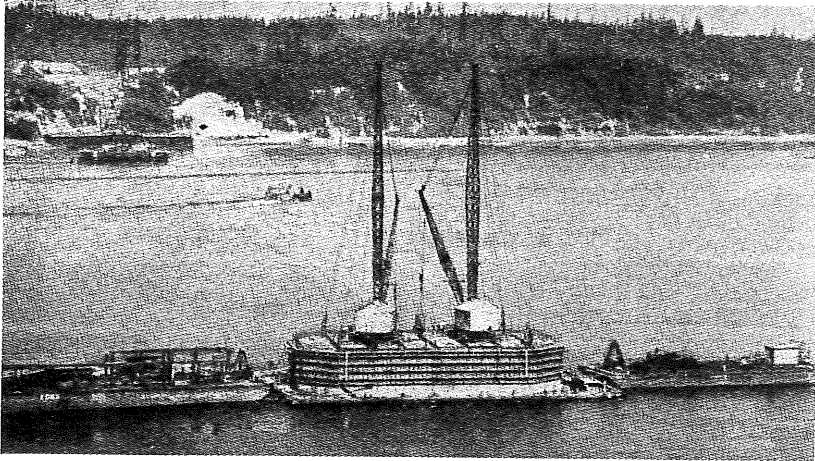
CONSTRUCTION OF PIER ON CAISSON SHOWN IN FIG. 118.
